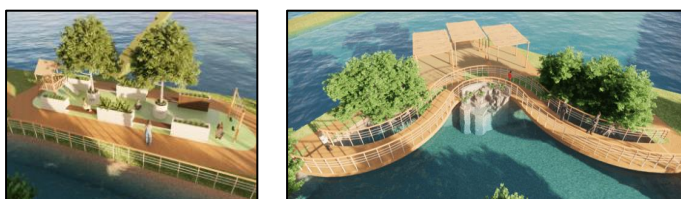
Mini Park (Left) and Viewing Deck Bridge with Mangrove Nursery at the Back.
